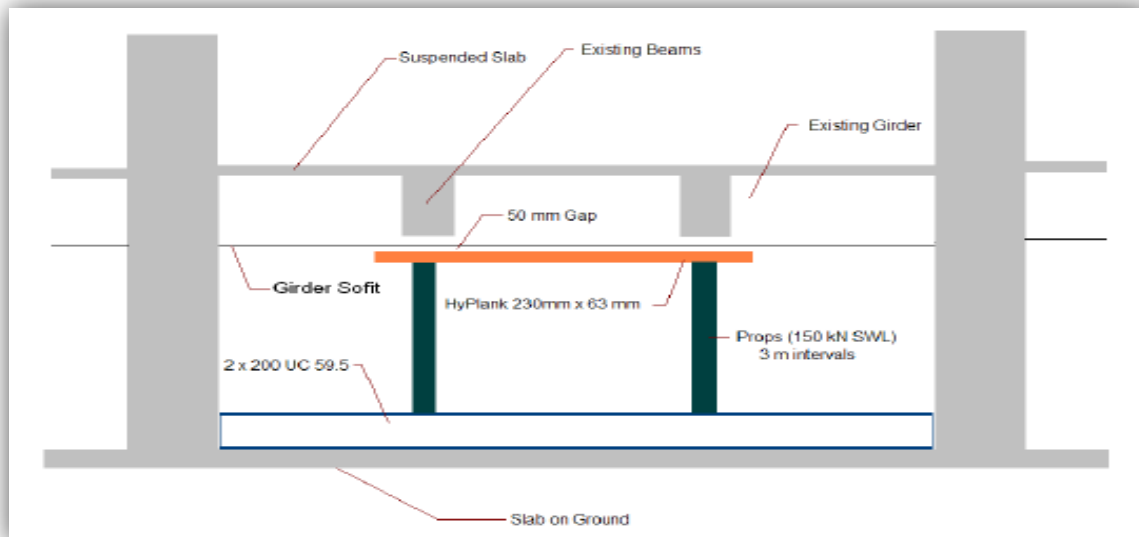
Propping set up devised by Aurecon to check the deflection of beams and girders under loads (Cartwright, 2011)
